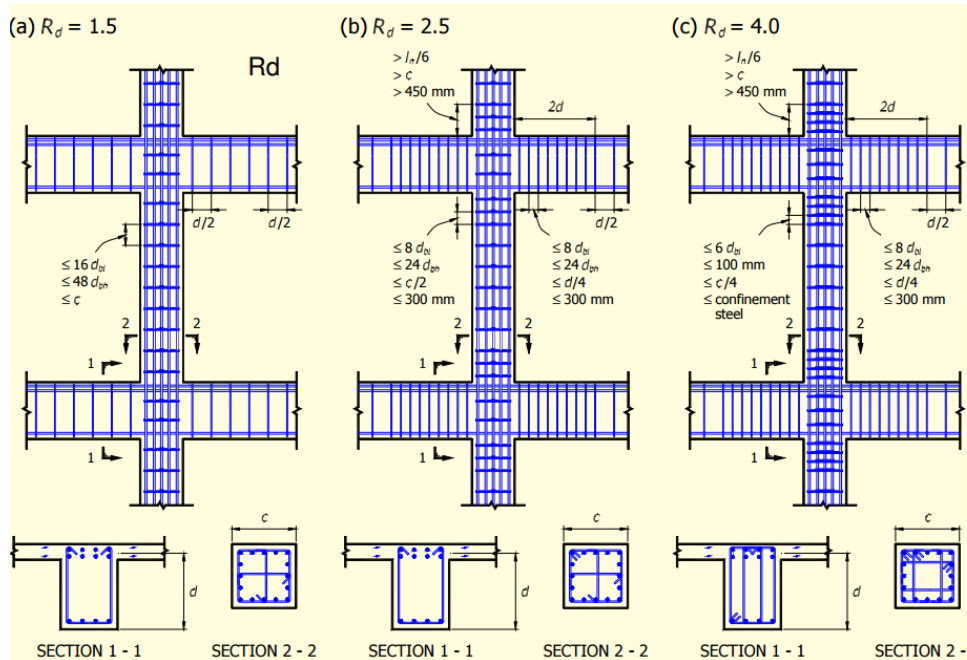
Spacing and details of transverse reinforcement of columns and beams (NBCC)
